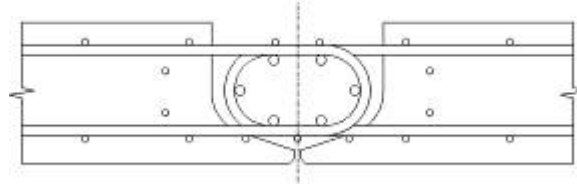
Example of concept for connection of top and bottom reinforcement for longitudinal joints
